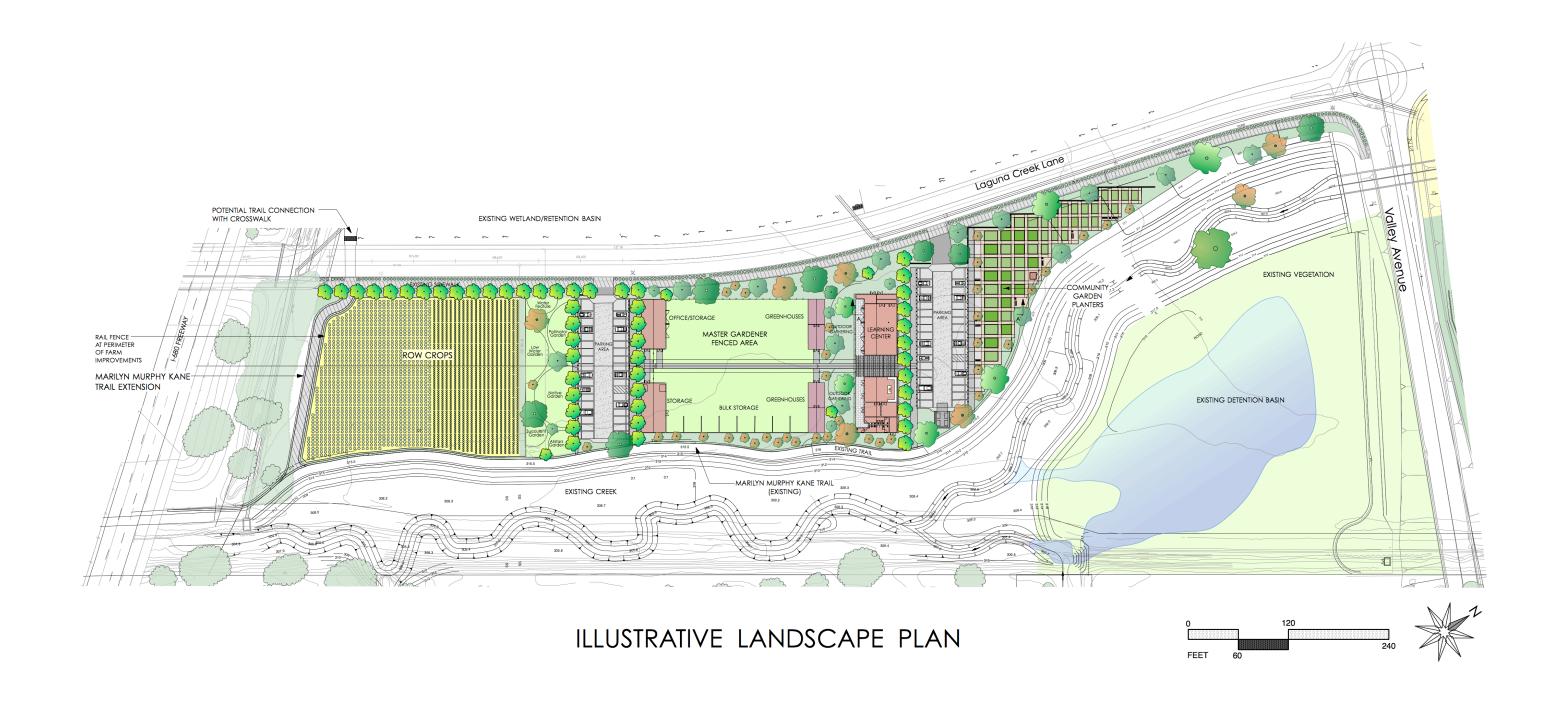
SUB-AREA 7 - CONCEPTUAL PLANTING PLAN
